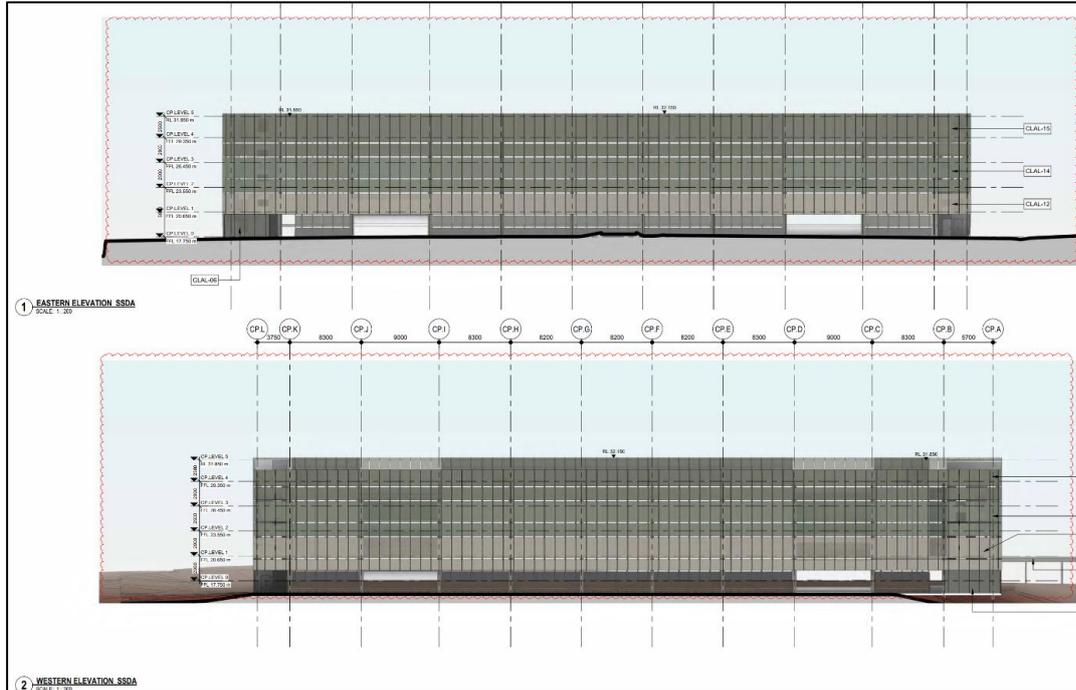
Approved Multi-deck Carpark East and West Elevations
